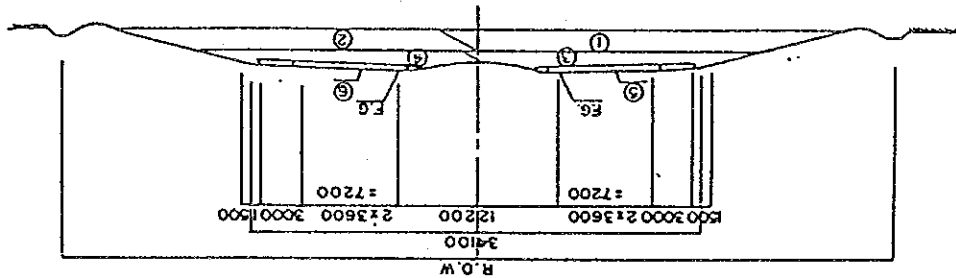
Scheme of Project Road Used as Construction Road
